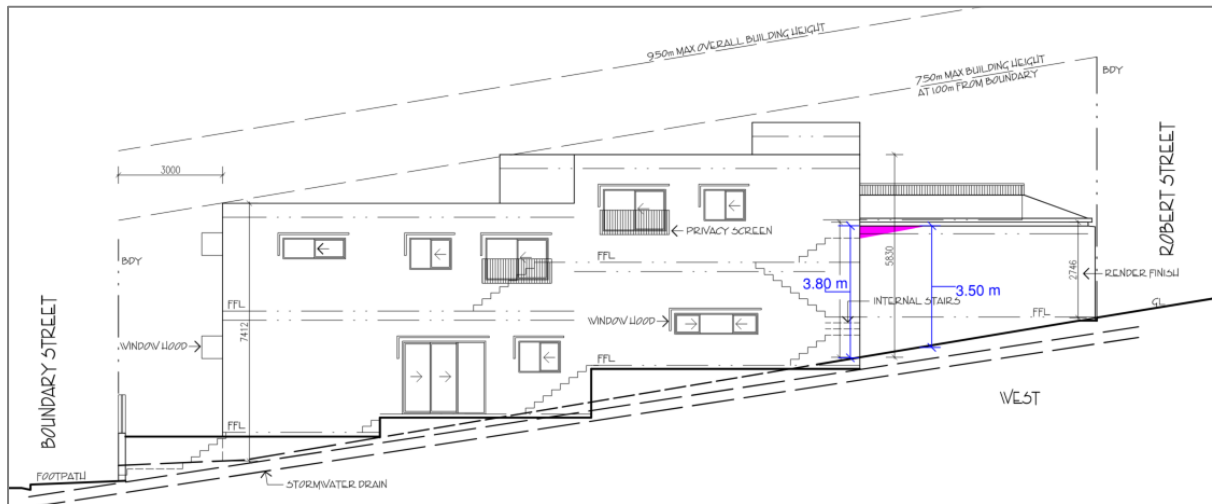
Proposed west elevation showing height of garage greater than 3.5m above ground level
